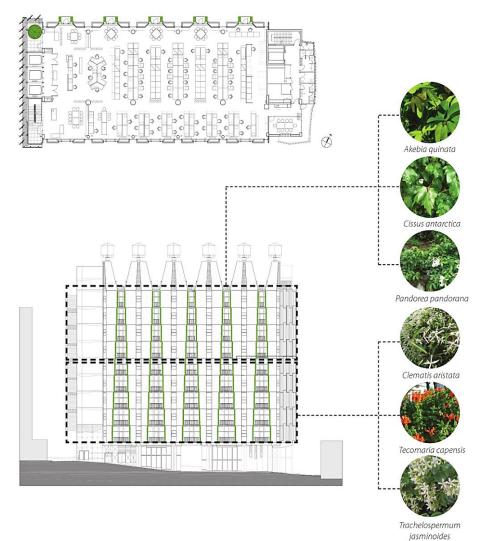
Northern façade elevation showing location of the green wall balcony side(CTBUC, 2014).
